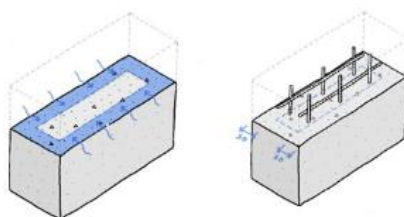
An Illustration Depicting A Cross-Section of Reinforced Concrete Structure (www.ivl.se, n.d.)
